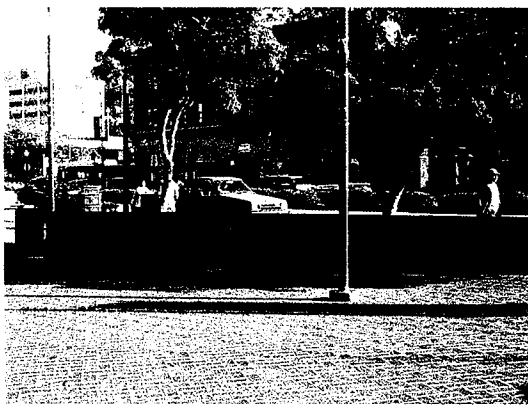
The existing brick paving at the Berkeley BART Plaza does not cause an accessibility concern, but can be hard to maintain.
